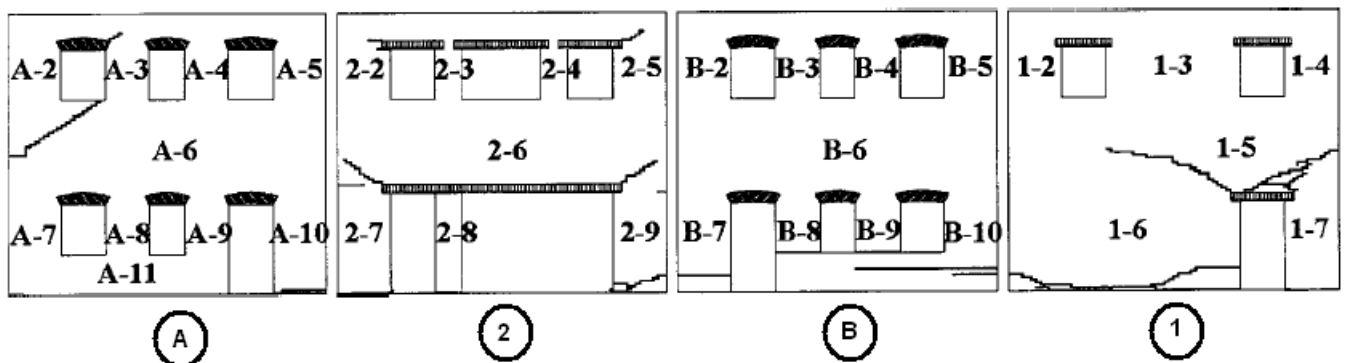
Final crack pattern for test structure after in-plane wall tests parallel to Walls 1 and 2
